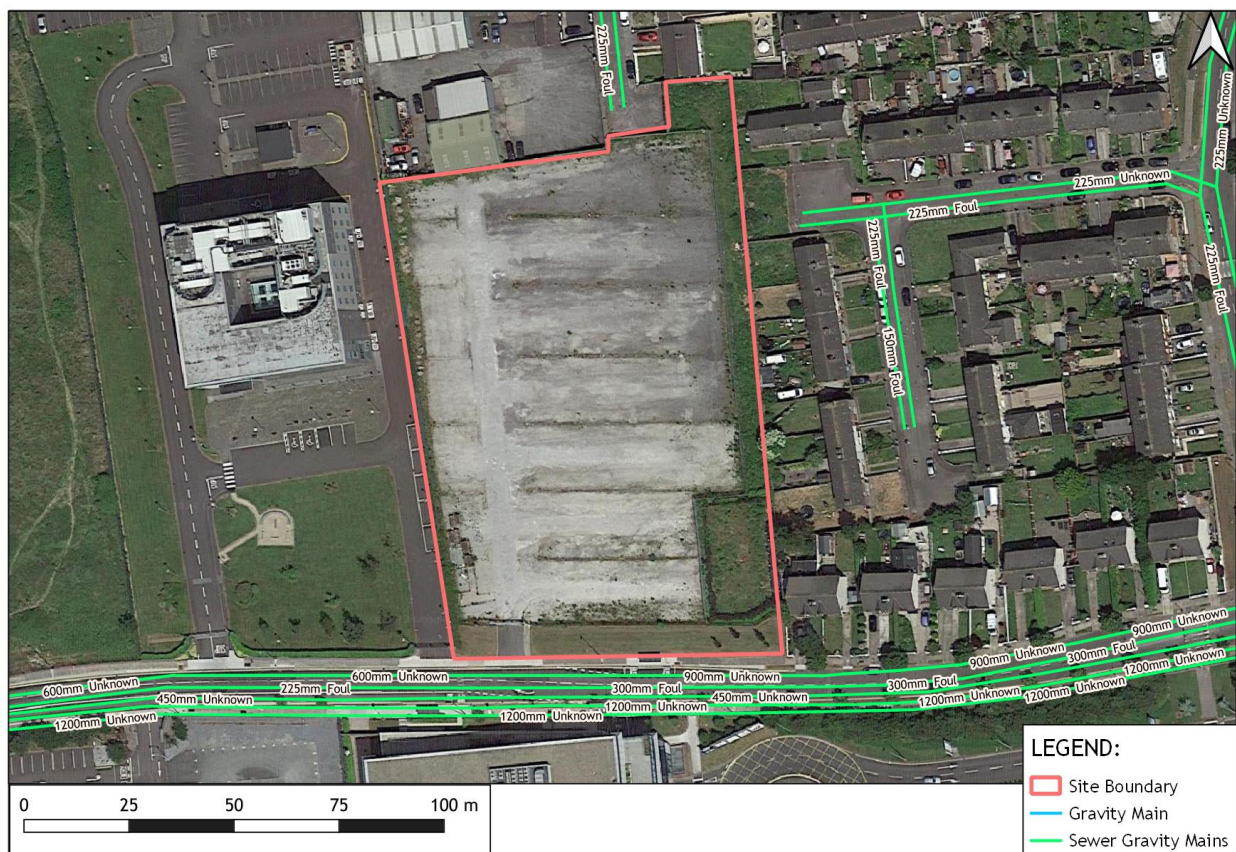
Existing foul drainage surrounding the site (Extract from Irish Water online records).
